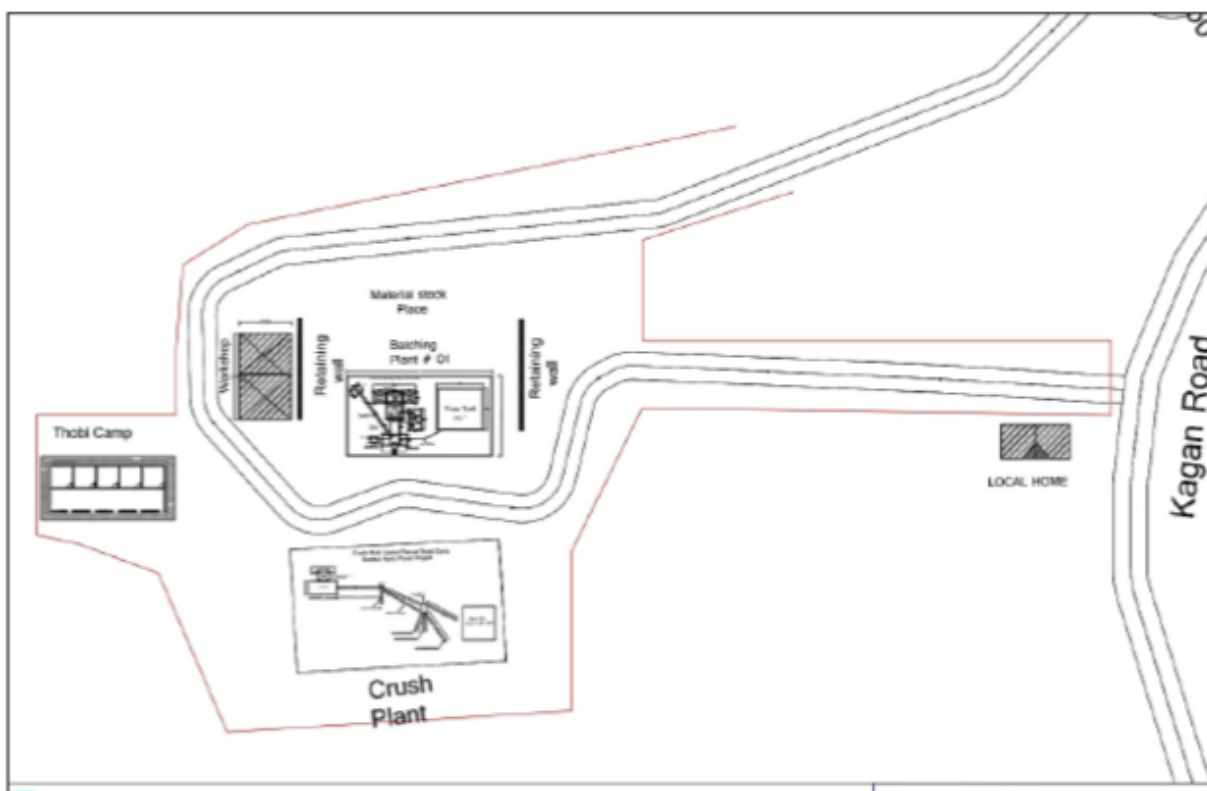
Camp Layout Plan constructed at Adit-3Figure 4-4: Layout Plan of Crush and Batching Plant
